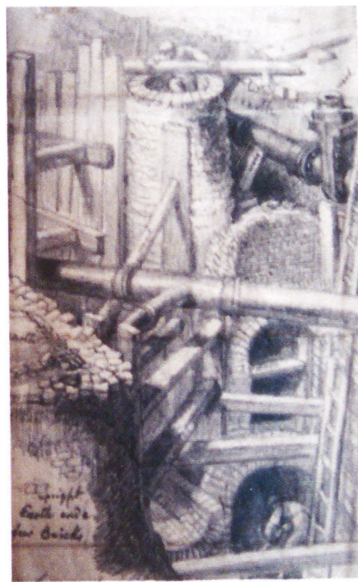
Sketch by George Scharf (BM, Prints and Drawings, British Roy Scharf)
